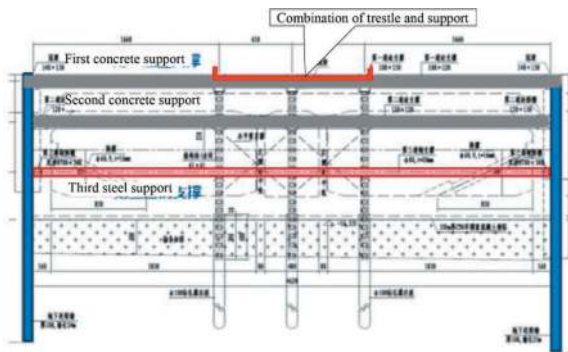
Typical cross-section of support and retaining structure for the cofferdam tunnel.
